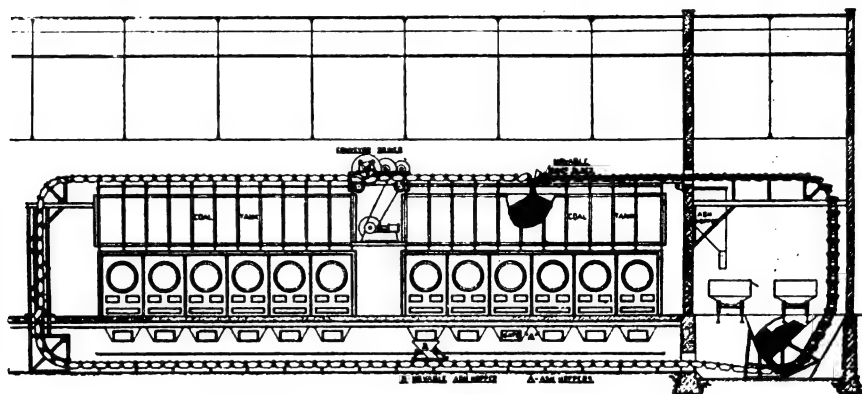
ARRANGEMENT OF COAL-HANDLING PLANT, CHICAGO CITY RAILWAY POWER HOUSE.
